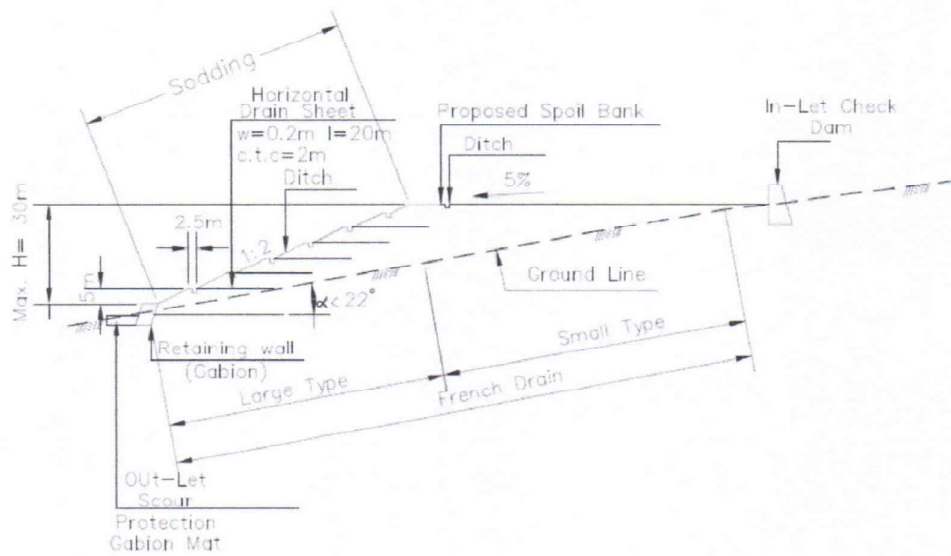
(b): Typical Arrangement for Spoil Banks: Profile
